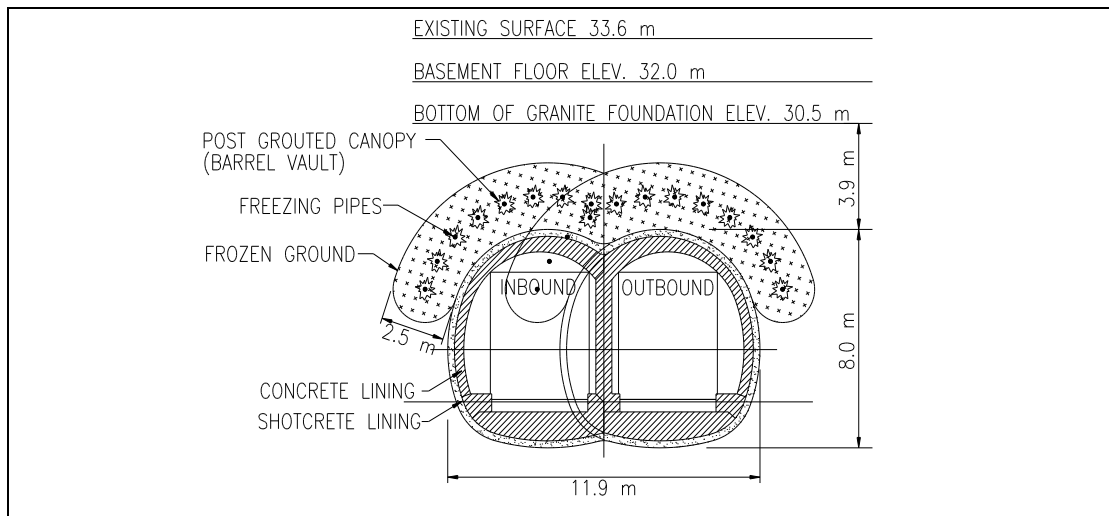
Typical Tunnel Cross Section and Frozen Arch
